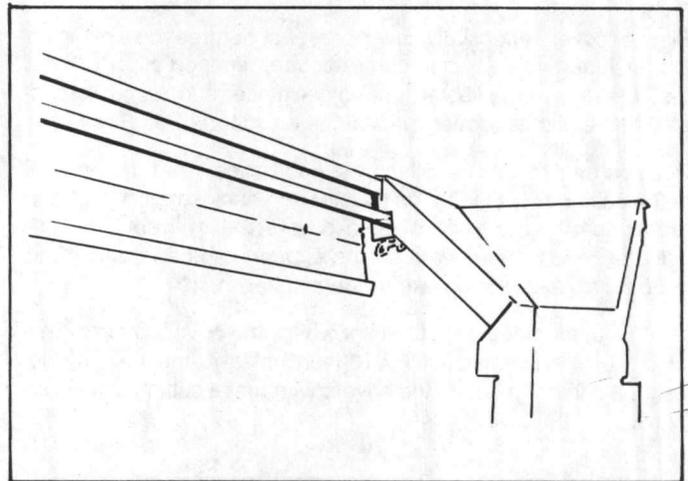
Inside Corner, Mounting Strip, and Locking Clamp (Front View)
